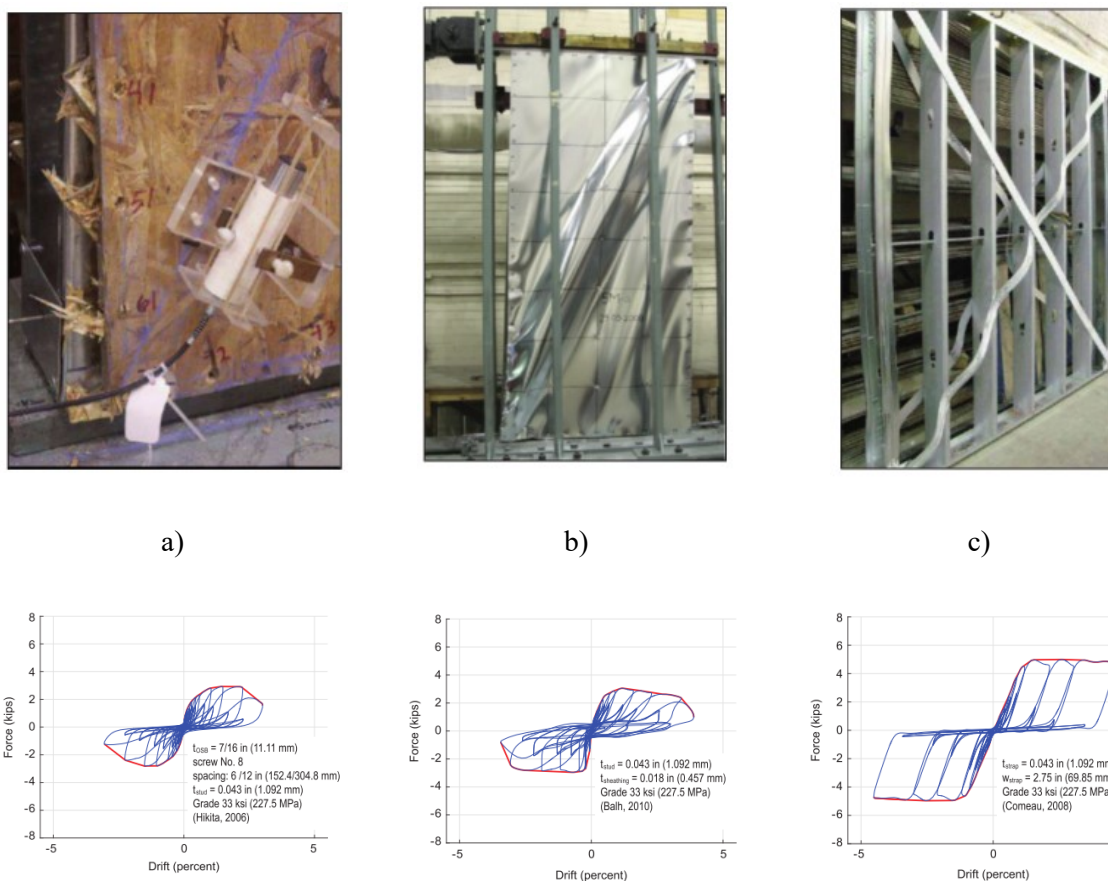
Failure modes and hysteretic behaviour of (a) OSB-sheathed walls, (b) steel-sheathed walls and (c) strap-braced walls (Madsen *et al.*, 2016)
